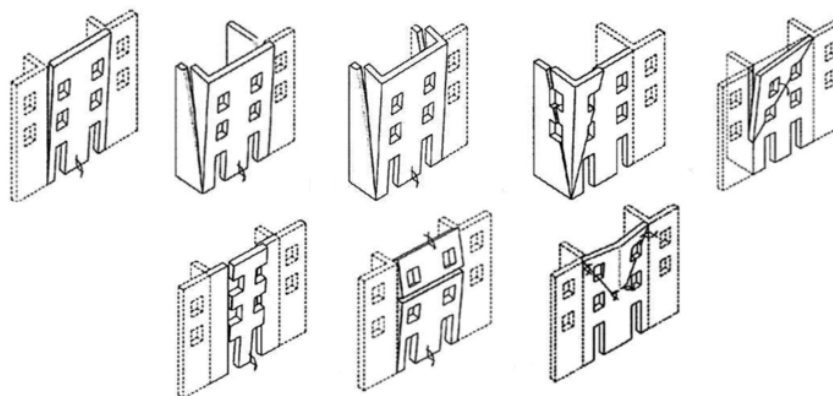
Out-of-plane failure modes of URM walls (D'Ayala & Speranza, 2003).
